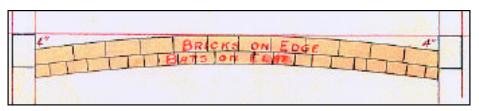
Engineering Drawing, construction of Right of Way between Medway Street and Severn Street, Box Hill, 1926, Shire of Nunawading "City of Whitehorse".
